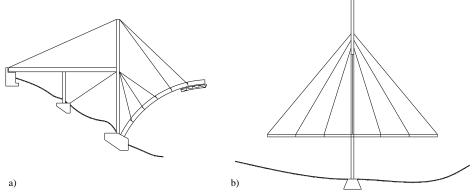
Partial elastic scheme: a) arch bridge, b) cable-stayed bridge
